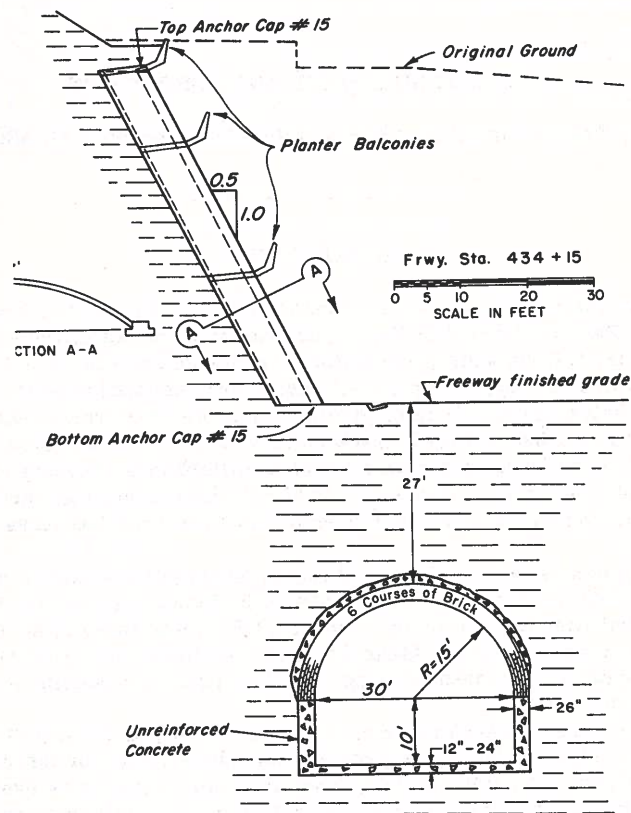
TUNNEL AND RETAINING WALL DETAILS
